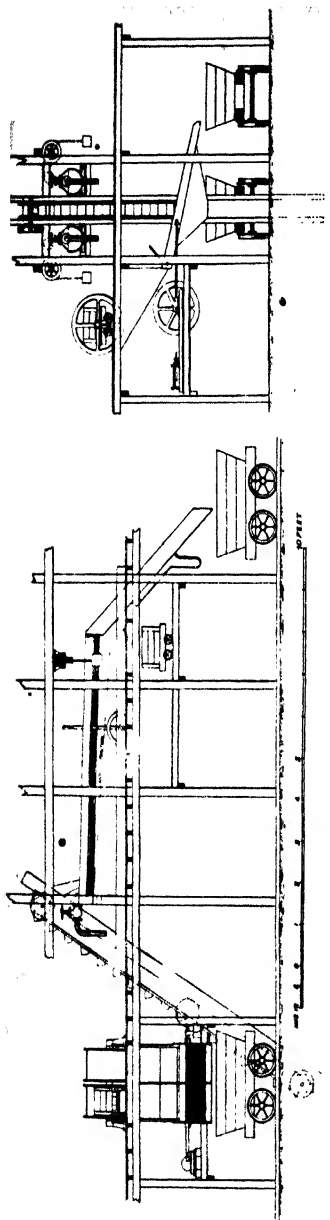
Bell and Ramsay washer. Plan, side and end elevation.
